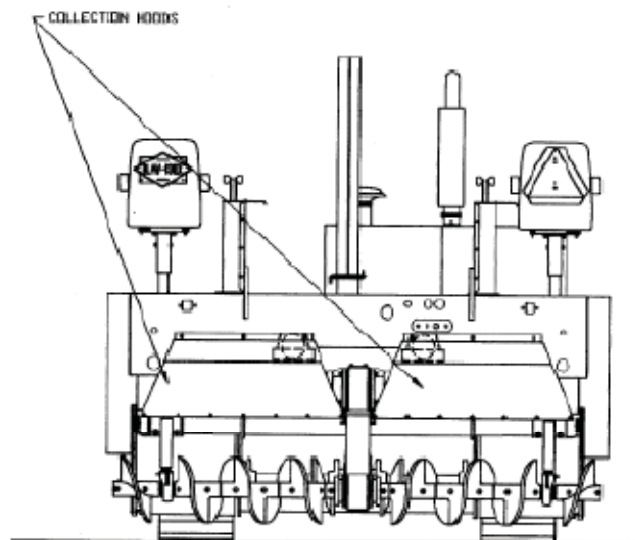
Drawing of the collection hoods used to collect fumes near the auger (from Construction Innovation Forum, 2006)
